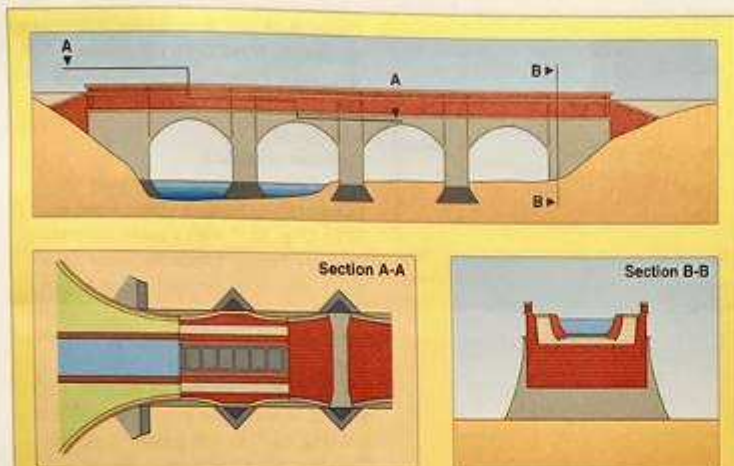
Elevation, part-sectioned plan and cross section of Kelvin aqueduct, the biggest in Britain at the time.²³ Side walls are curved in plan for extra lateral stability.
